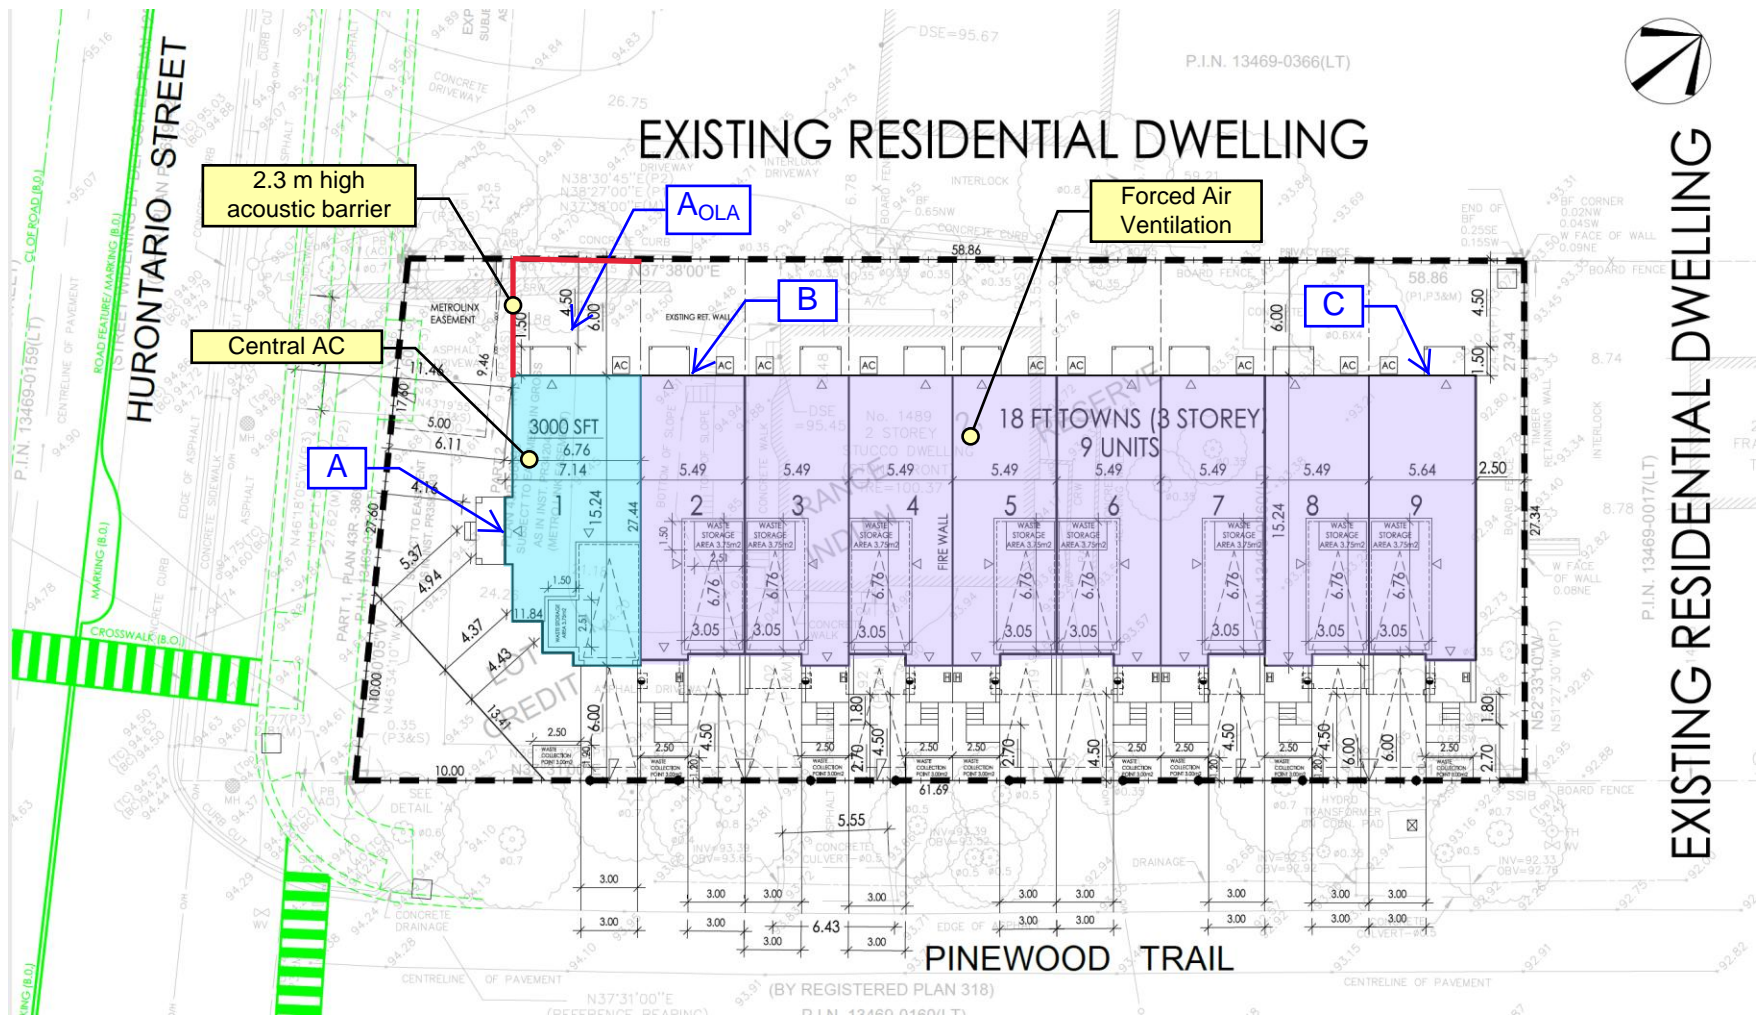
Proposed Site Plan Showing Barrier and Ventilation Requirements
